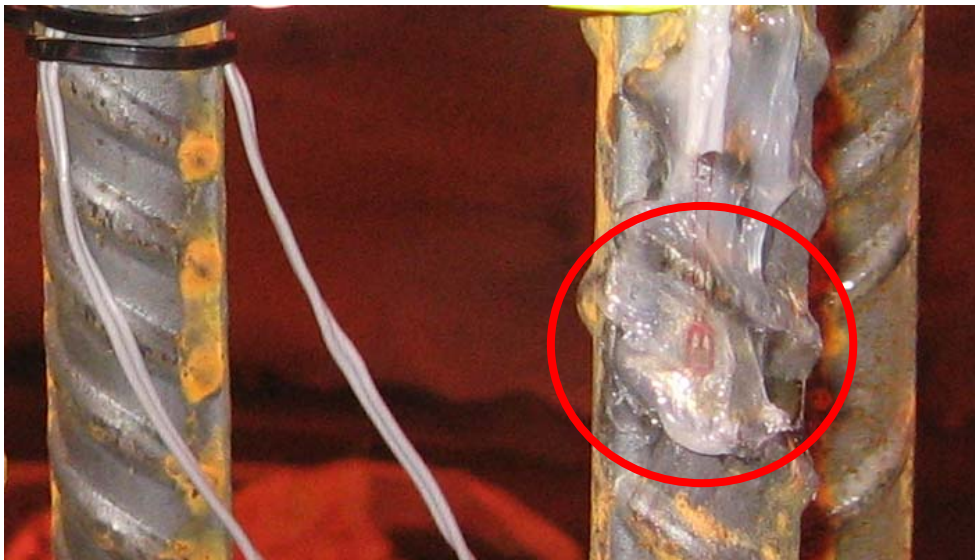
Surface gage mounted on a vertical rebar and silicone coating.
